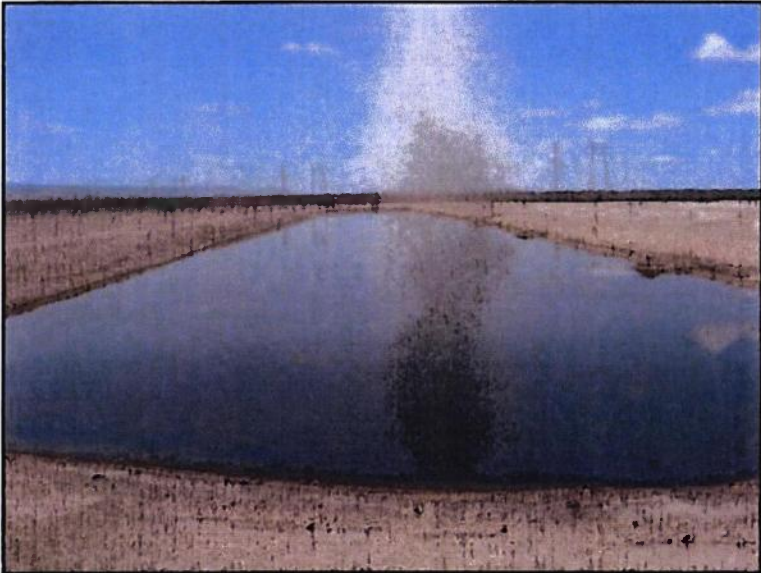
View of sixth row of impoundments looking northwesterly.
